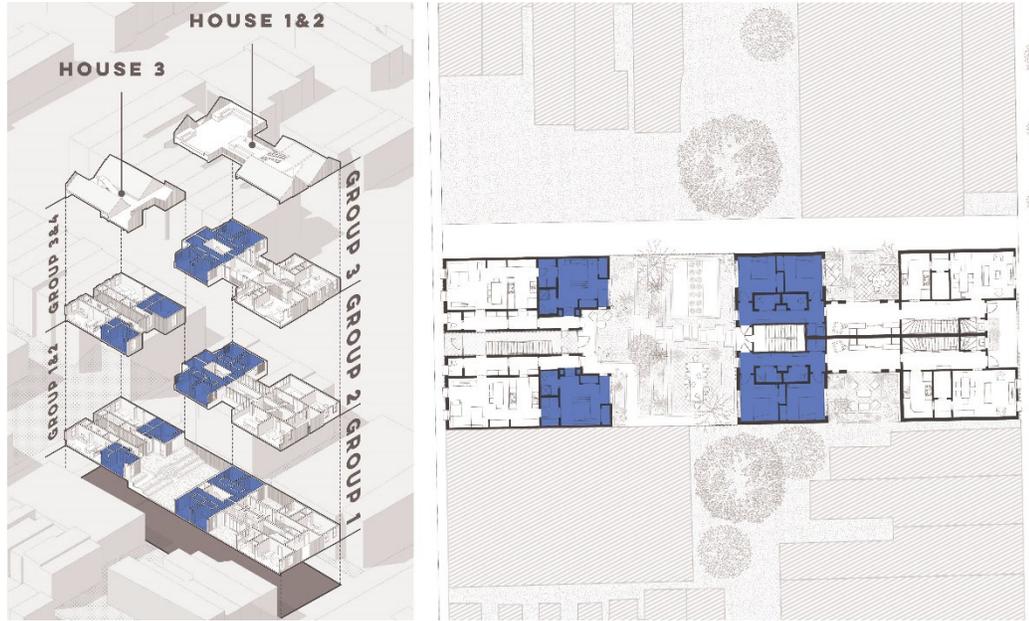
A diagram showing the vertical loading of private space, (Source: Author)
